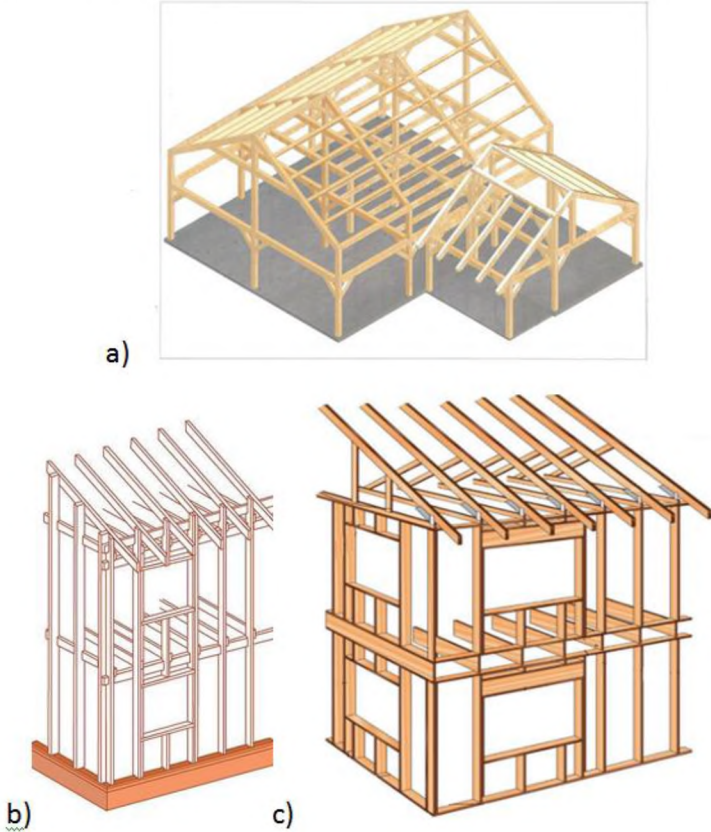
Timber Framing Systems [4, 5, 6]:
